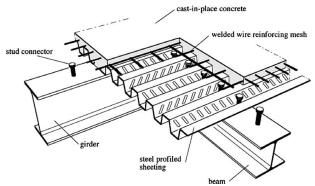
Composite floor with steel profile sheet Source: Mohammed *et al.*, 2011b
